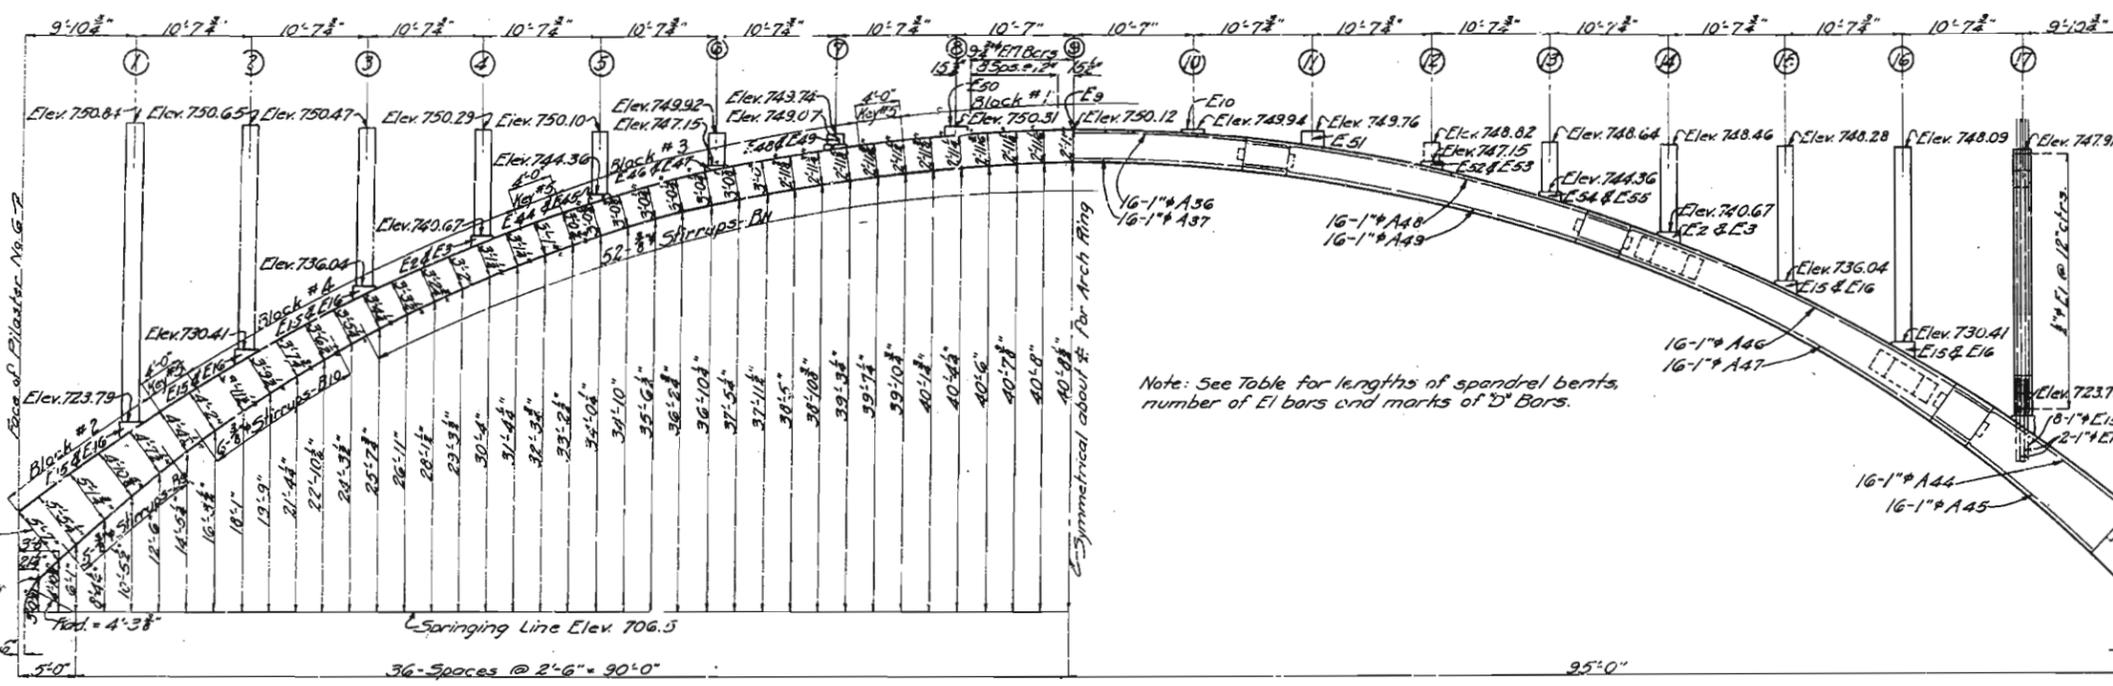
DETAIL SHOWING DIMENSIONS OF ARCH RING, SPAN 4-5
